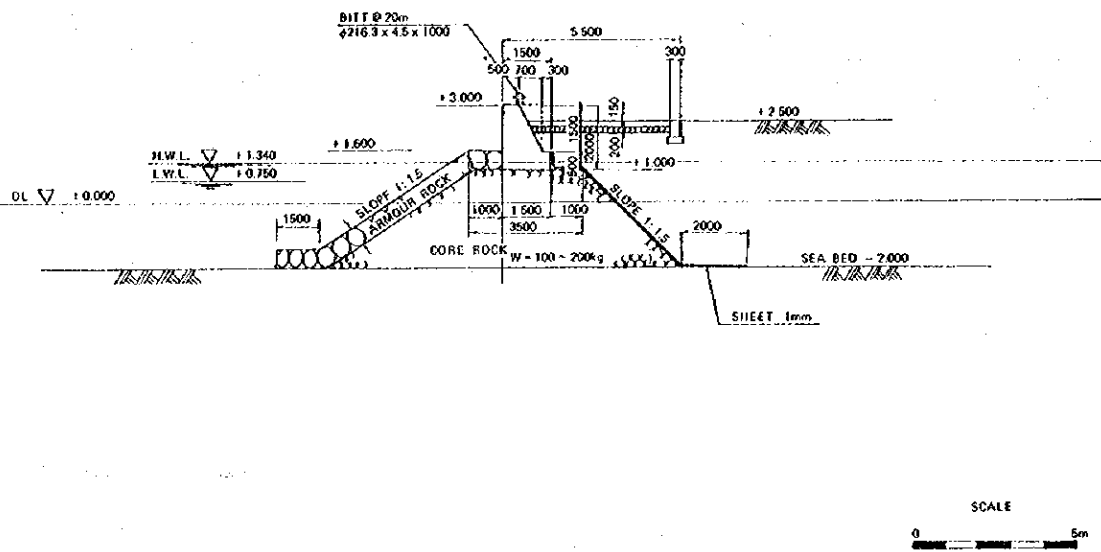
Cross Section of Rock Bulkhead – Hoilo Port
